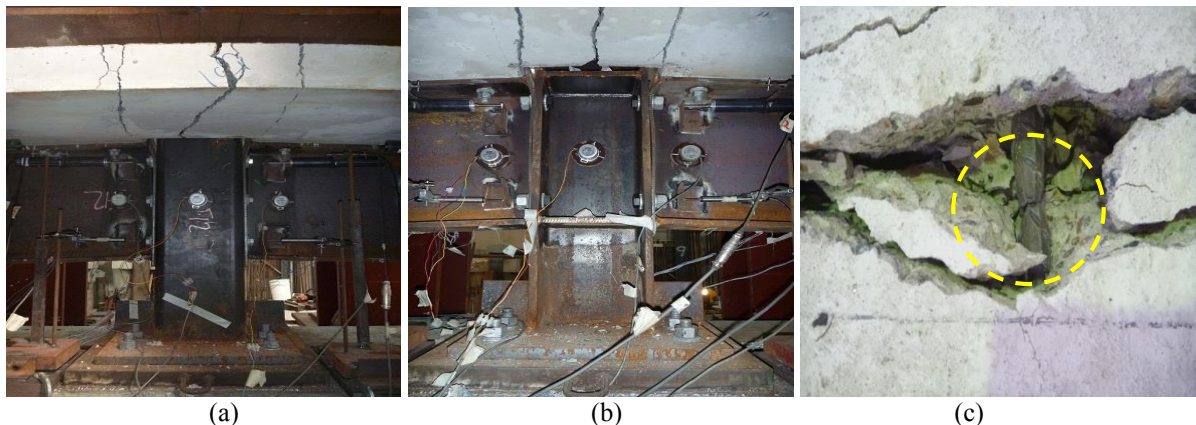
(a) Specimen CJ2 after the test; (b) specimen CJ4 after the test; (c) typical failure mode of the specimens.
